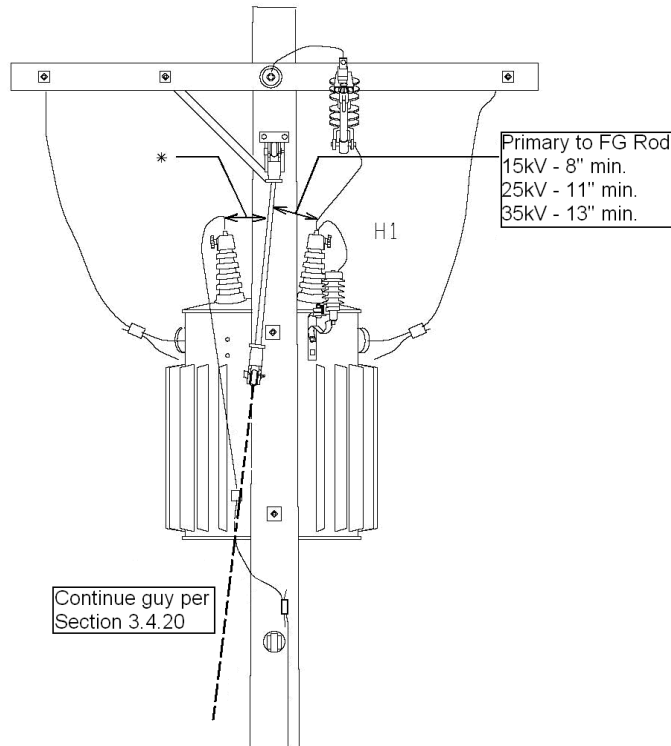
Guy Wire Clearances (Using Table 8 Clearances)
